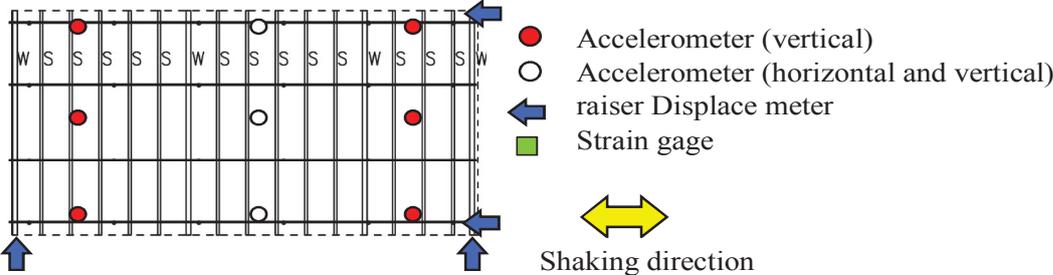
Locations of accelerometers on the suspended ceiling and transducers at the base of the frame
